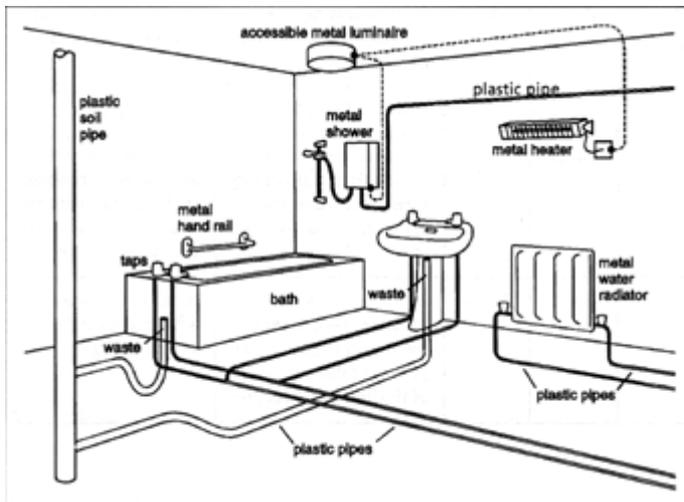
Supplementary bonding in a bathroom - plastic pipe installation
